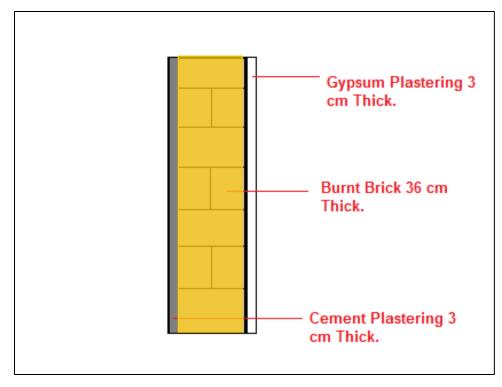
Section in the exterior walls of Ronaki house (Kareim, 2018)
